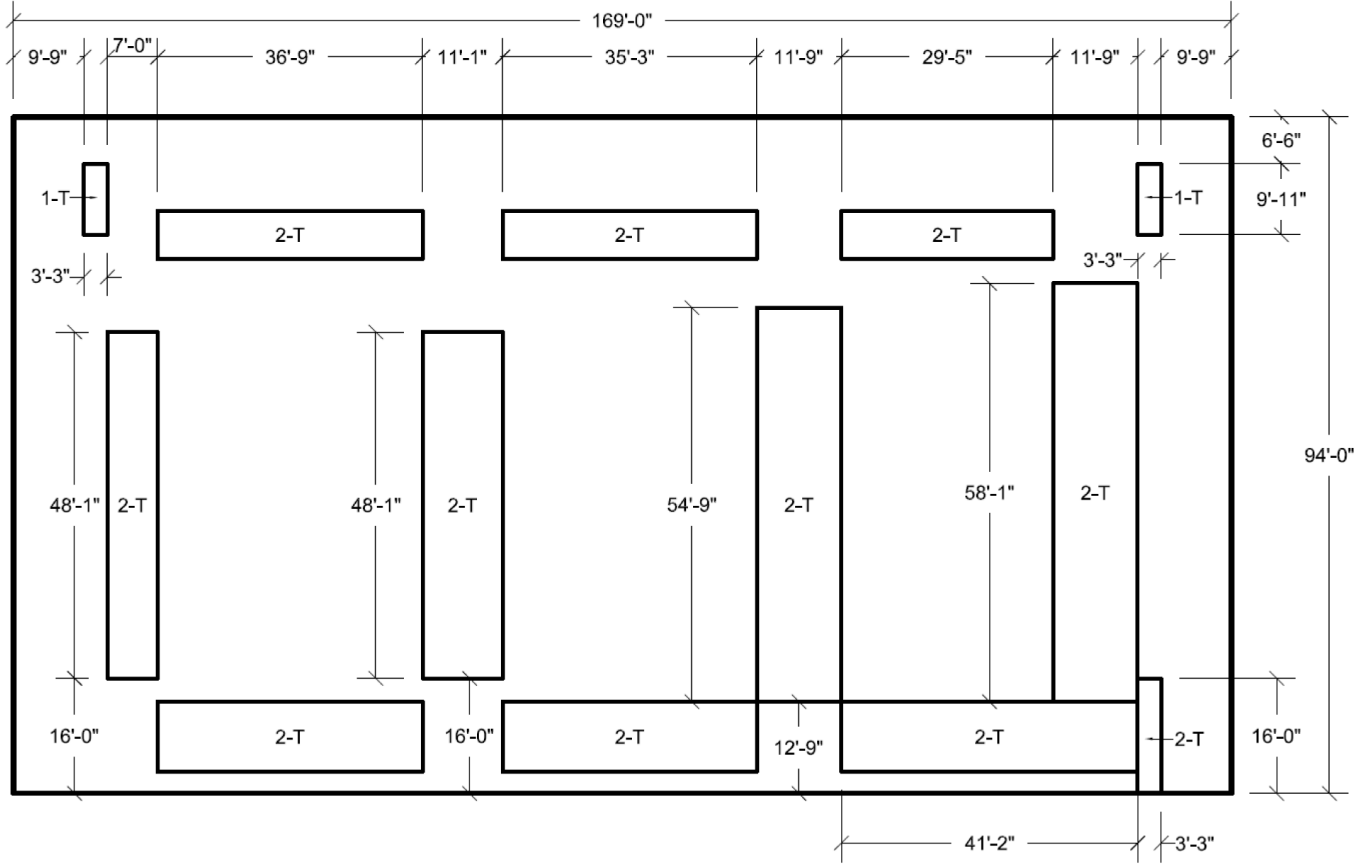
H.6-126A Pump House Foundation Mat Transverse Reinforcement Zones
